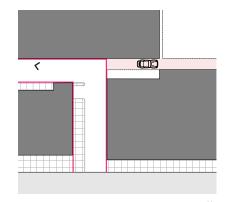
Private Void 3; 1:1,200 Existing, plan
